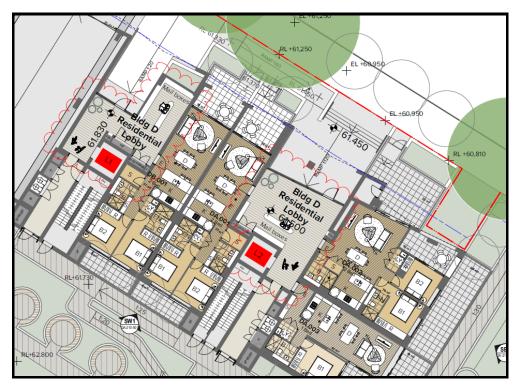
Proposed lobby for Building D (Source: Turner, March 2023)
